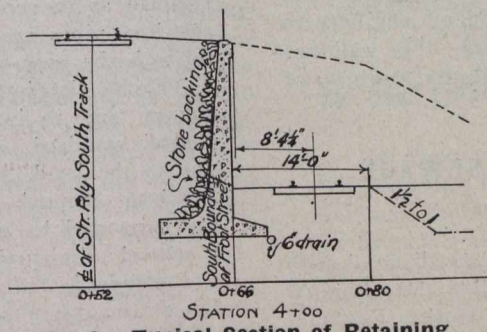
Typical Section of Retaining Wall at Station, 4 + 00.
